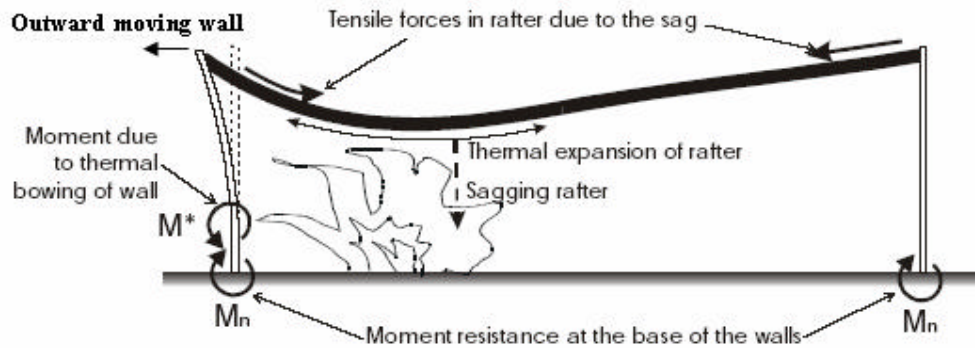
Outwards collapse of Cantilevered Wall Building (Lim, 2000)
